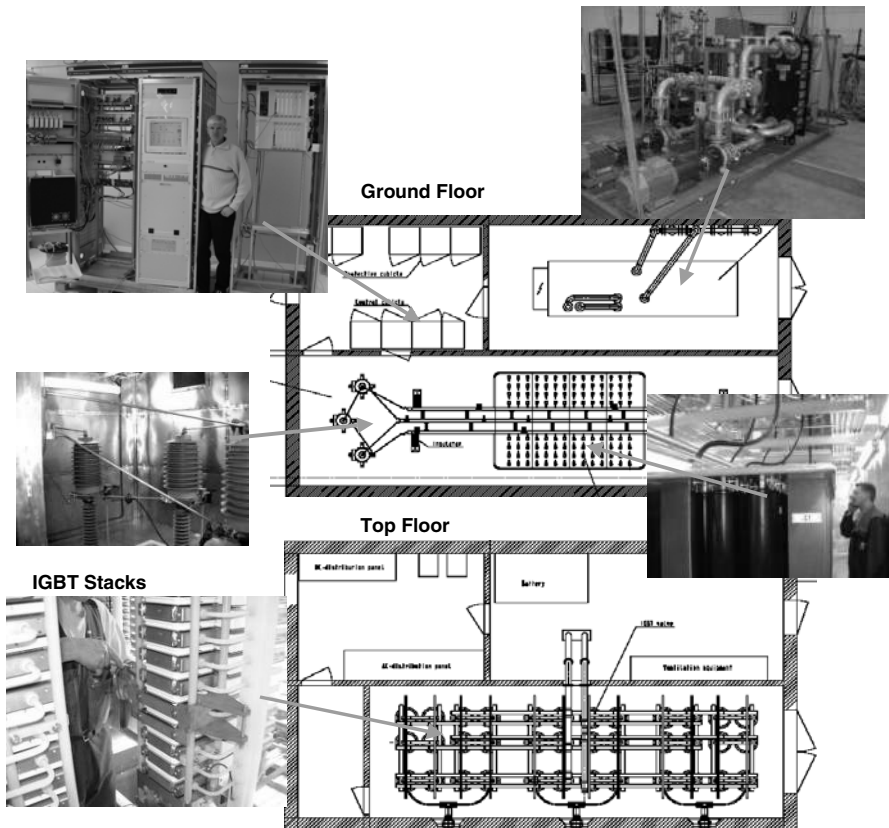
Typical layout of a STATCOM-building (Source: ABB)
